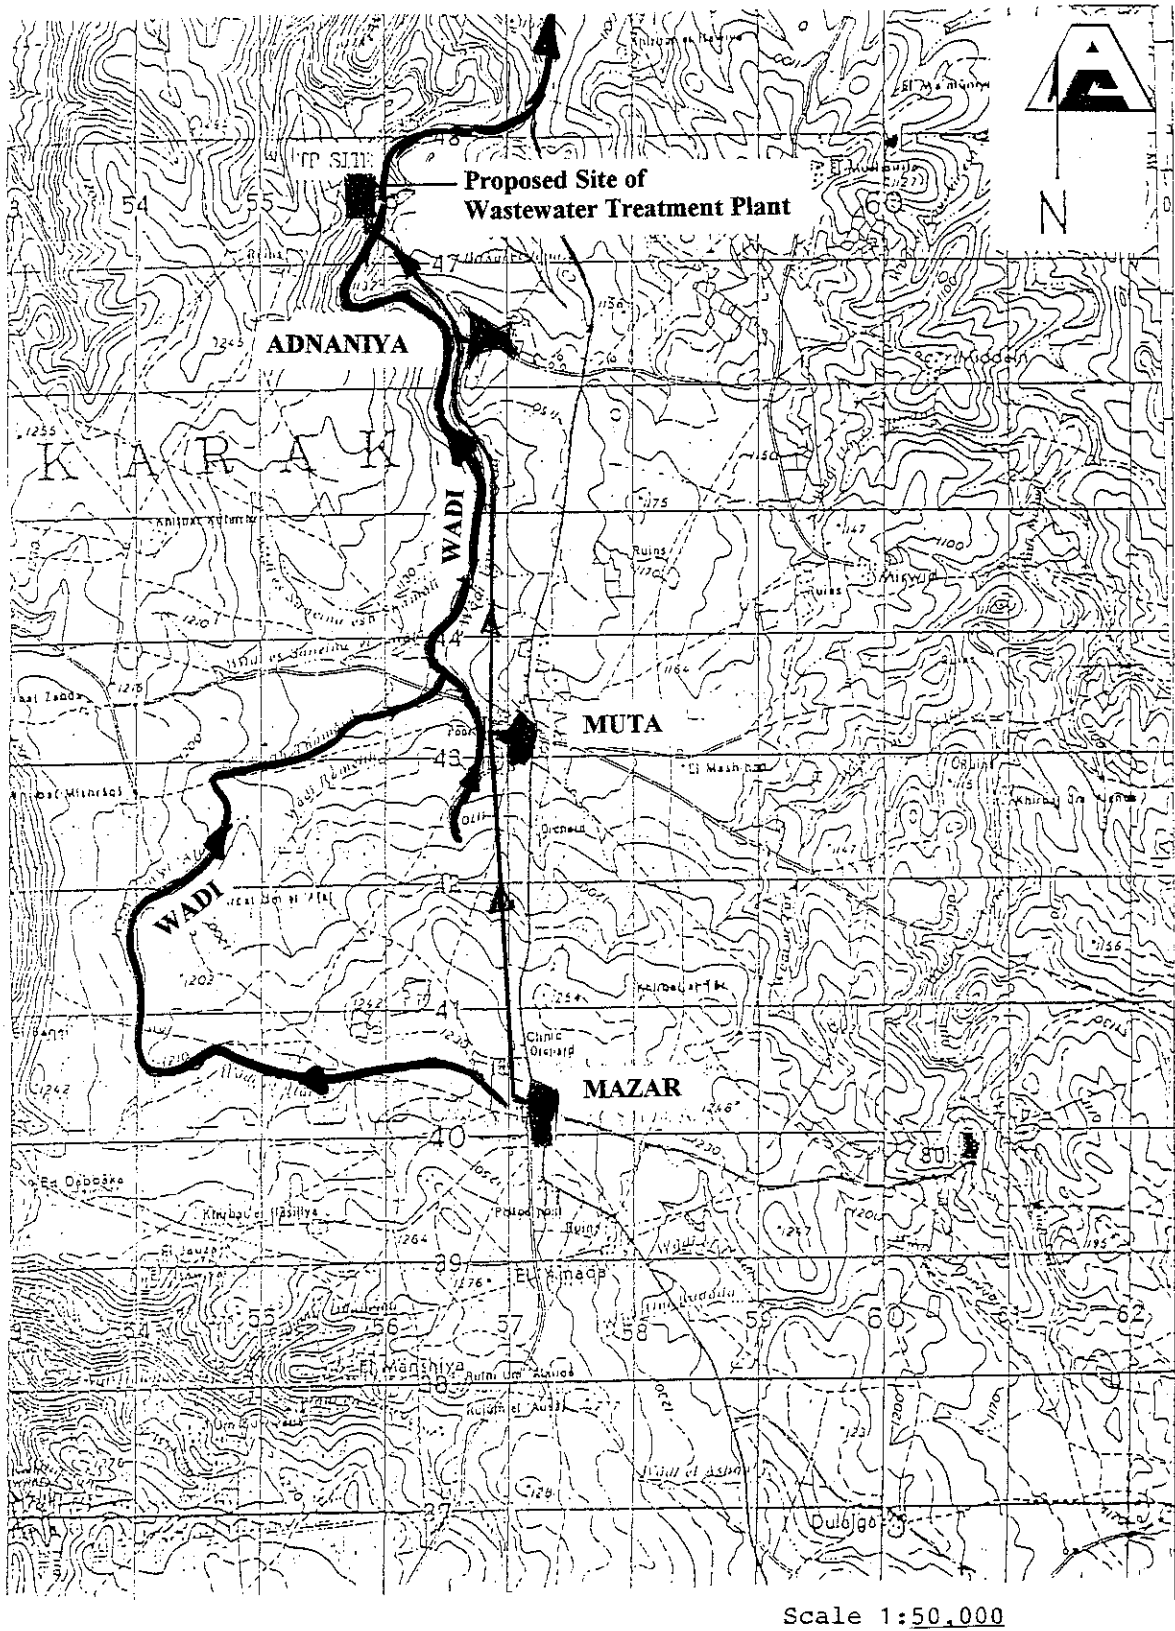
General Layout of Proposed Sewerage System - MAZAR – MUTA - ADNANIYA
